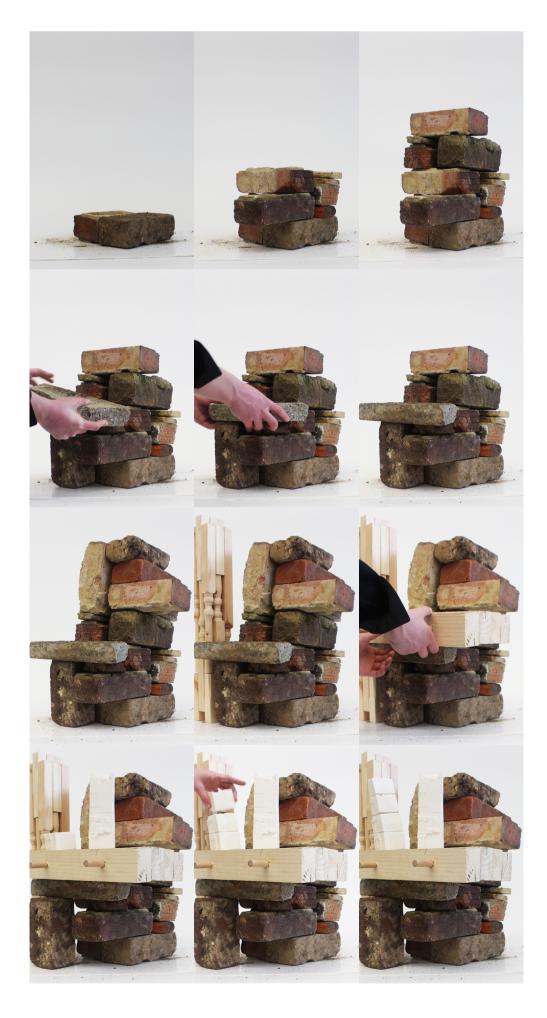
Testing a waste construction strategy. 1:1. (Author's Own)
